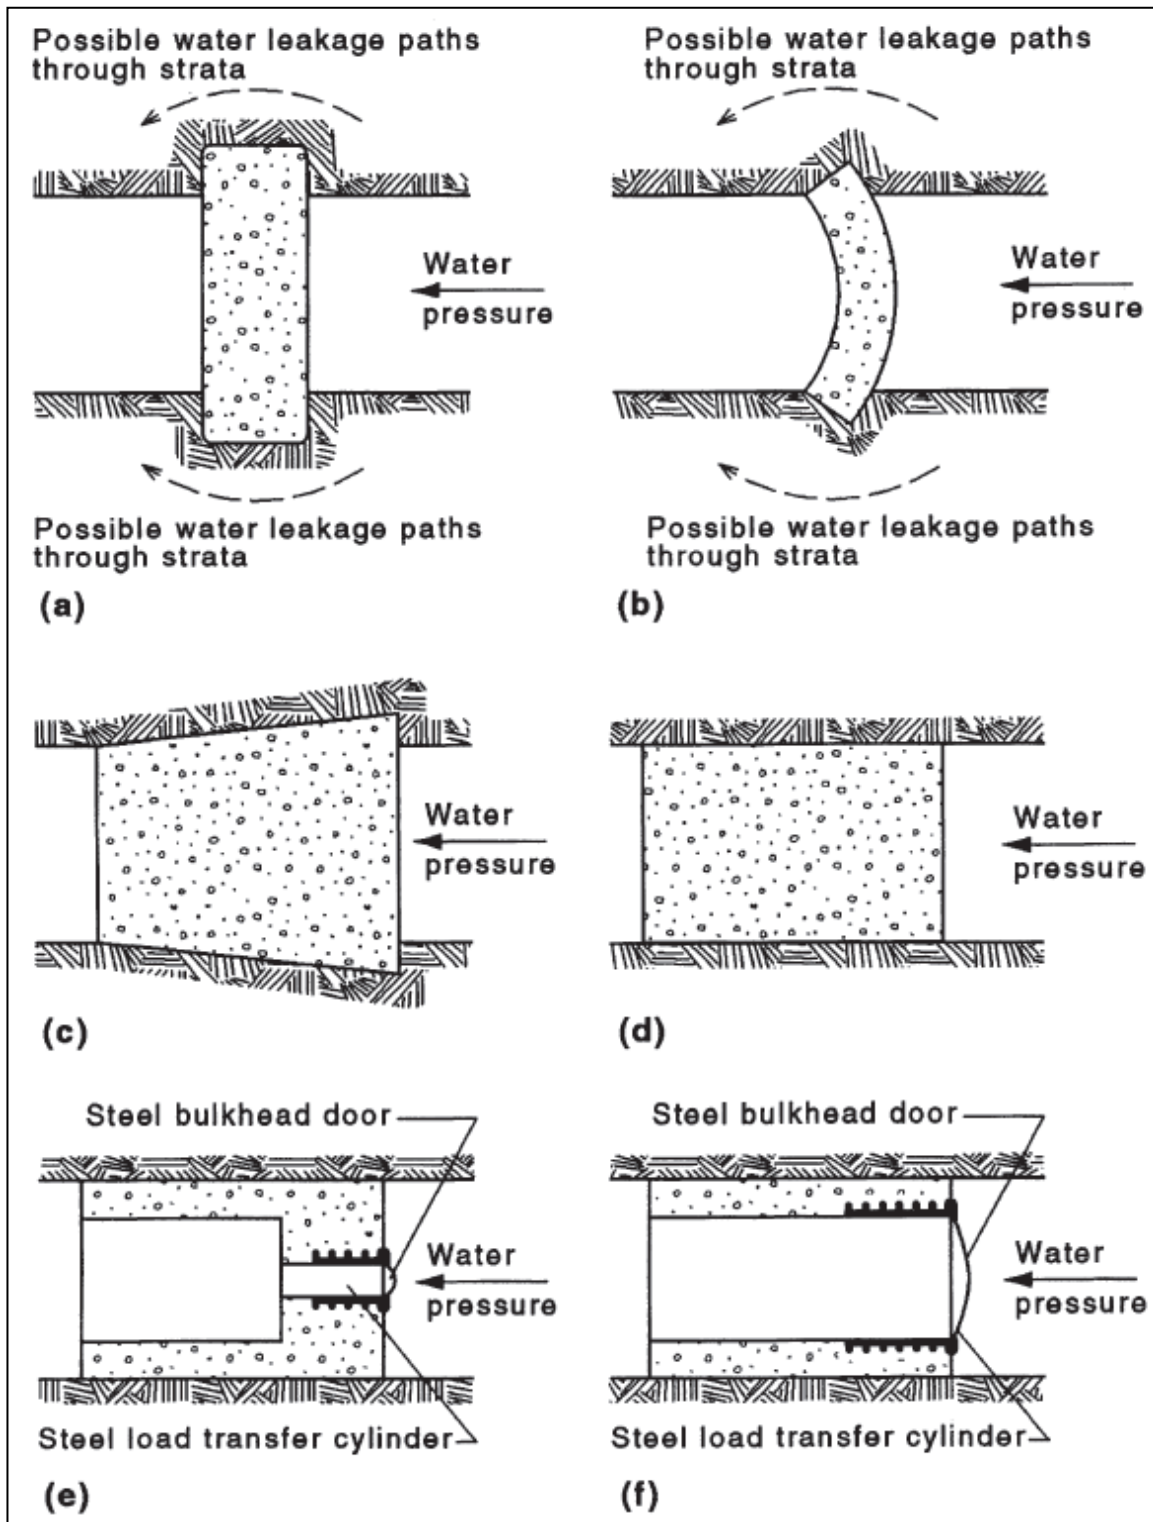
Basic concrete plug shapes (Auld, 1996). (a) Reinforced concrete wall; (b) Unreinforced concrete arch; (c) Unreinforced concrete tapered plug; (d) Unreinforced concrete parallel plug; (e) Unreinforced concrete cylindrical parallel plug, with human access; (f) Unreinforced concrete cylindrical parallel plug, with roadway access.
